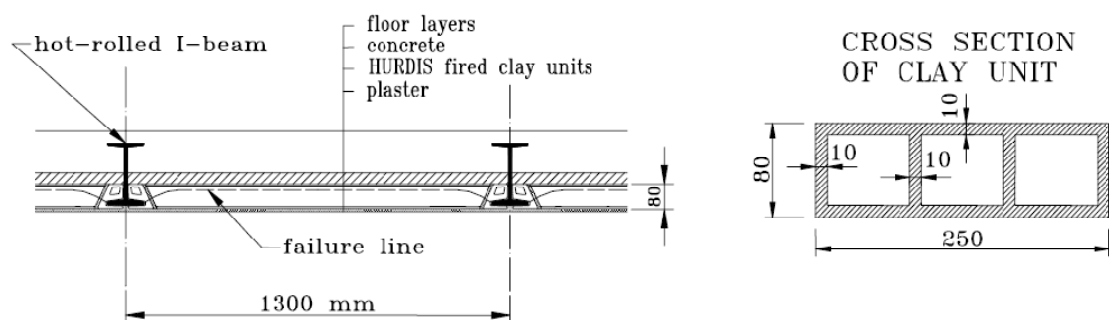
Scheme of the floor structure and the cross section of a clay unit used [1].
